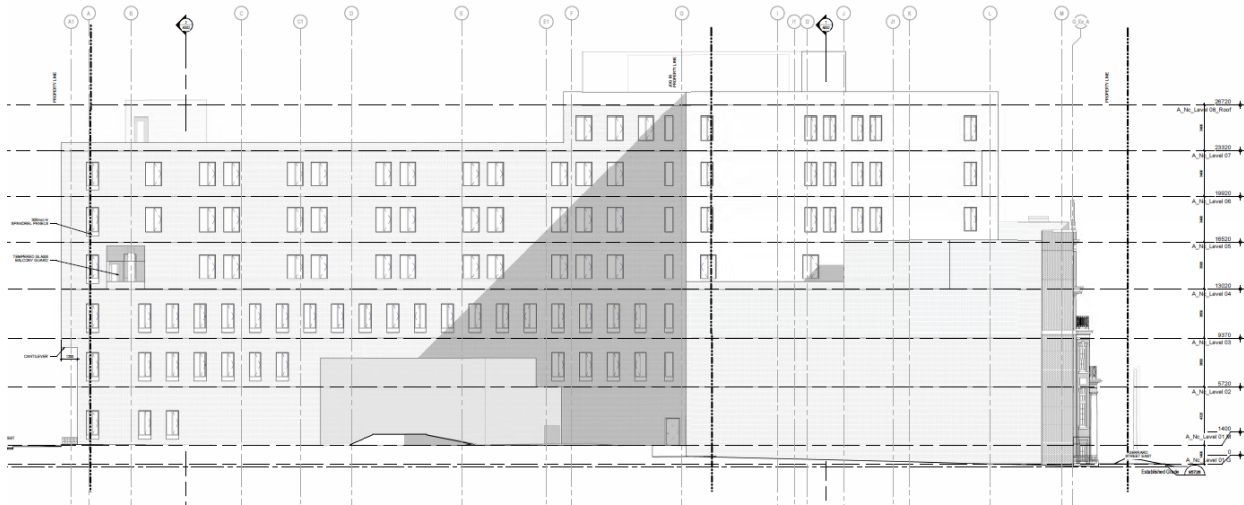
East elevation drawing included for illustration purposes (ERA Architects Inc., March 3, 2026).
